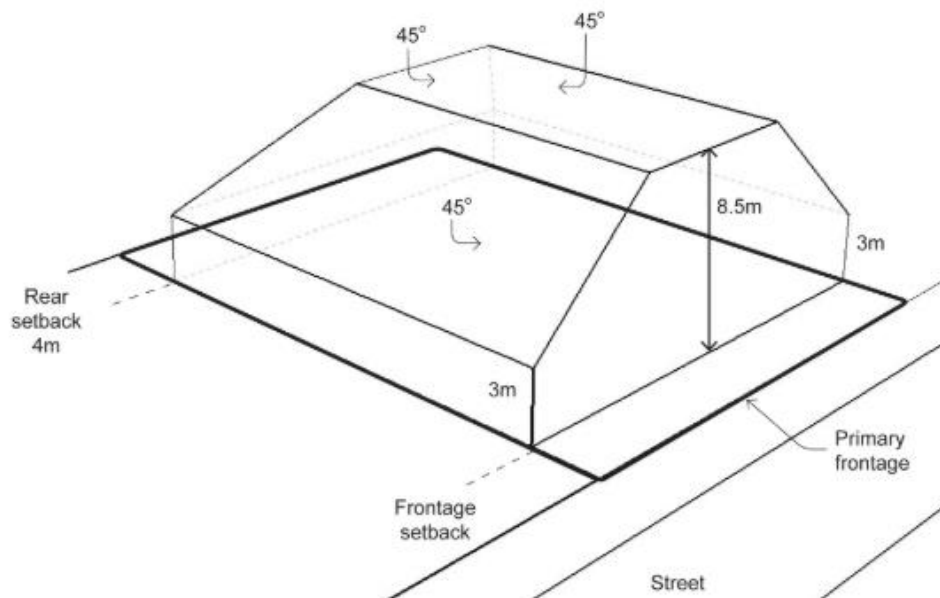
Building envelope designated by 10.4.2 A3 (a)
